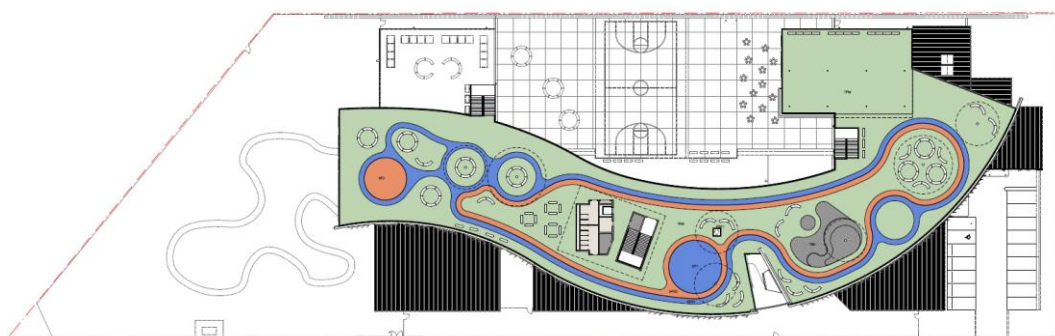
Extract of Site Plan - Roof Top Plan (prepared by Perumal Pedavoli Architects)
